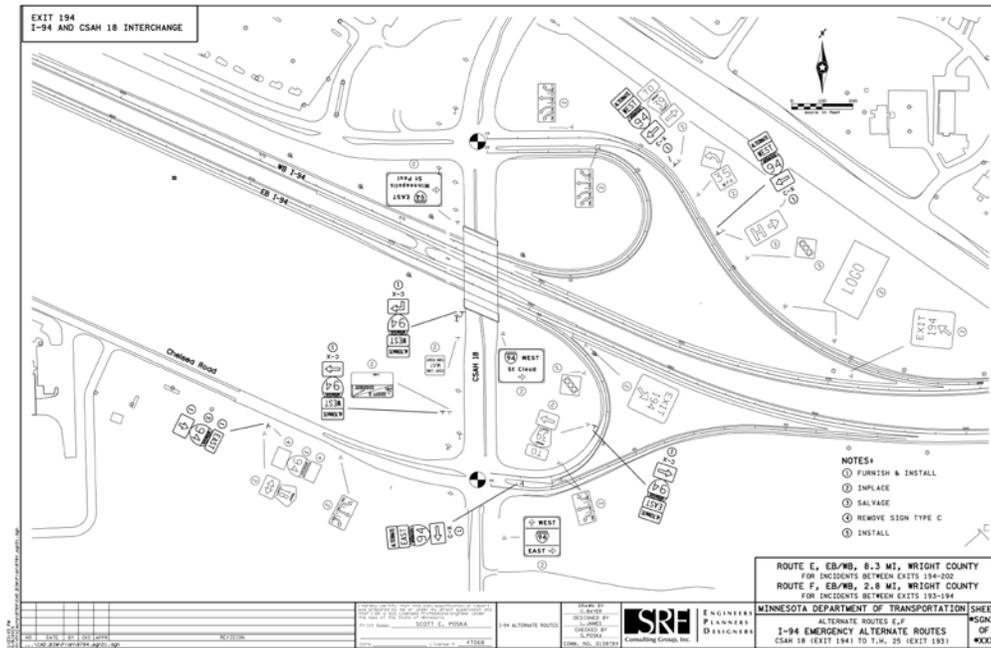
I-94 Alternate Route Signing Plan Sample Page (Interchange Layout)
